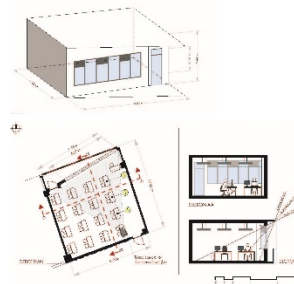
Geometric properties in plan, section and 3D view of Zone 1 (Classroom).
